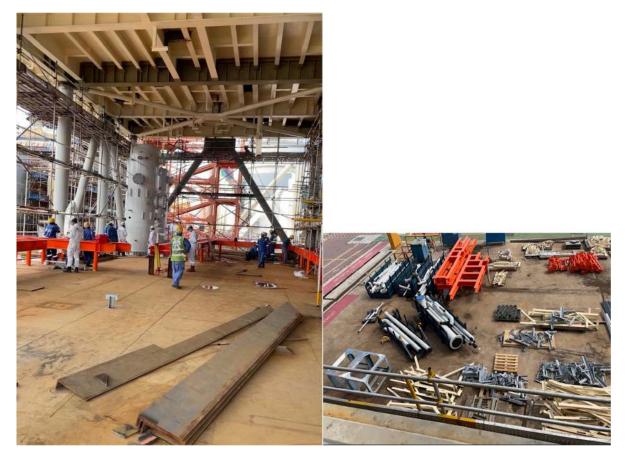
Inside view of Module M30 Figure 2-4 Piping ready to be installed on M30
